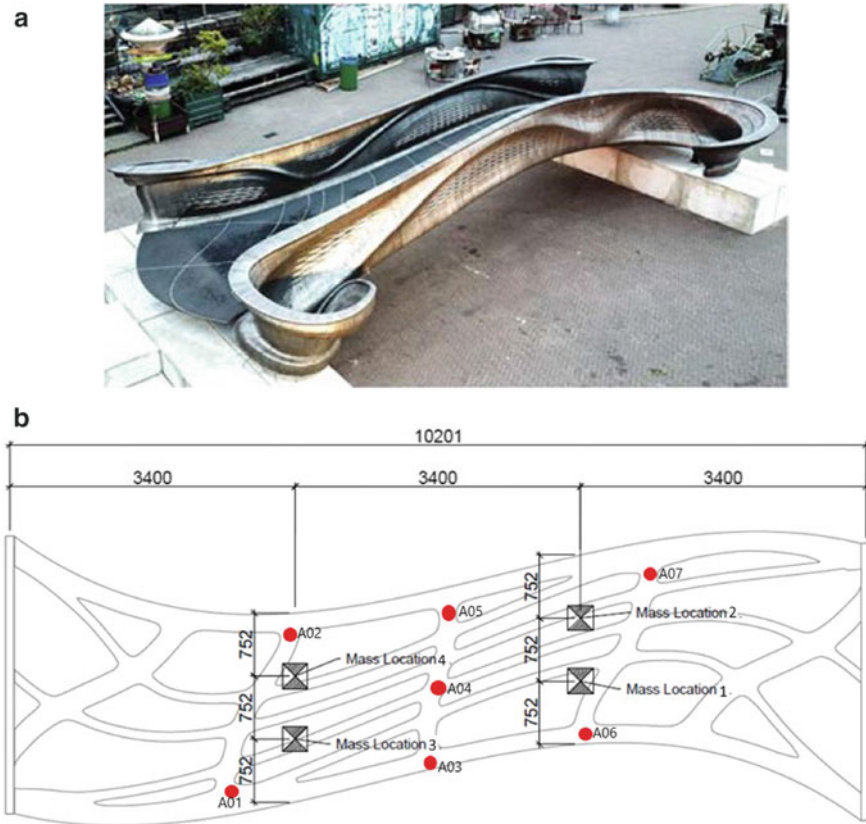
a Overall view of MX3D Bridge (left); b locations of loading and accelerometers (right)
